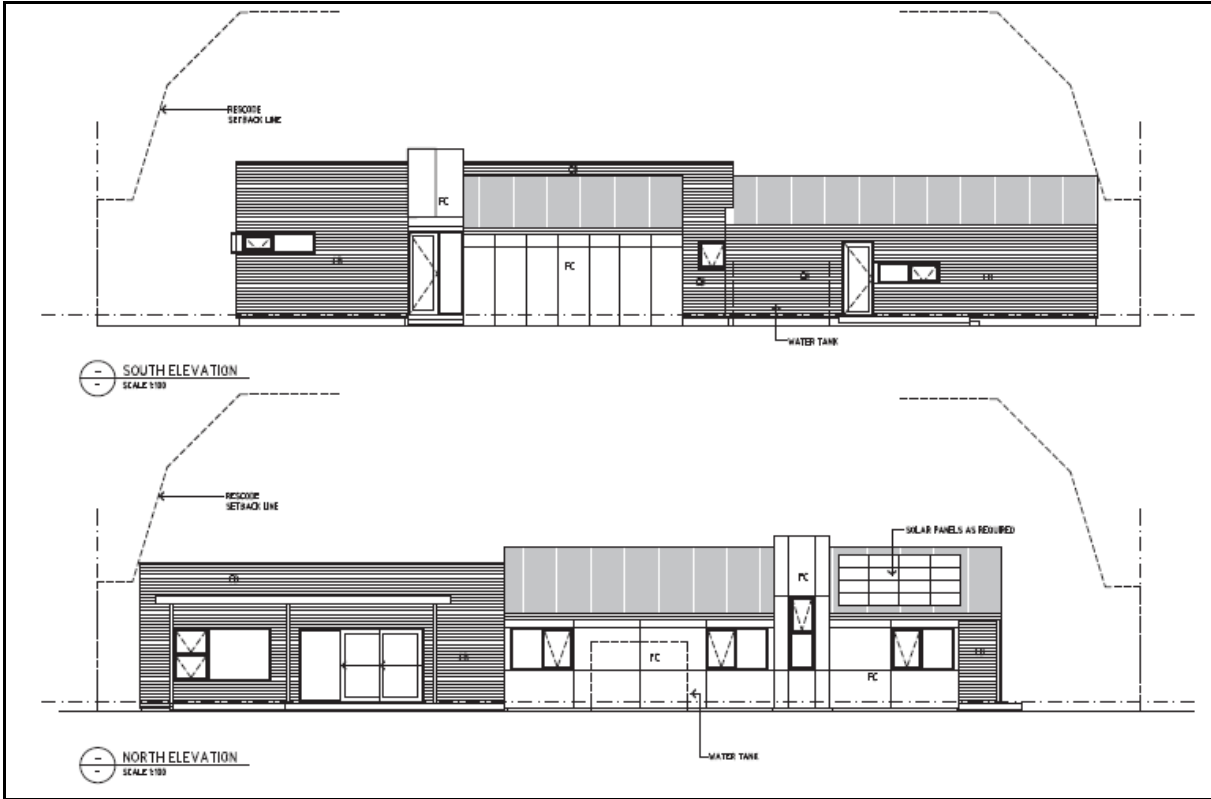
Proposed elevations (Adam Dettrick Architect, 2012).
